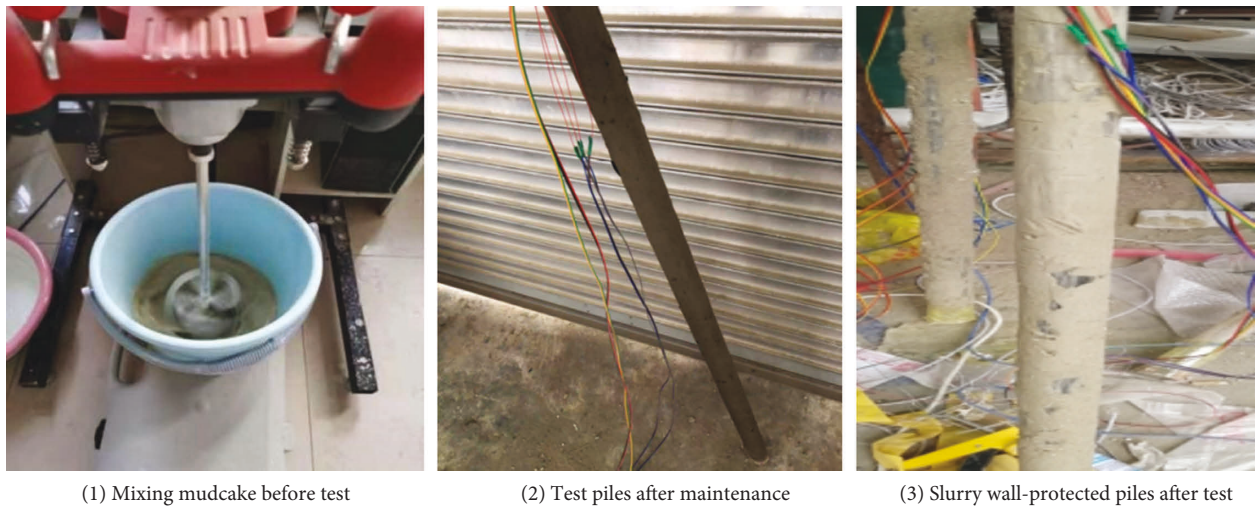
Model piles. (a) Mixing mudcake before test. (b) Test piles after maintenance. (c) Slurry wall-protected piles after test.
